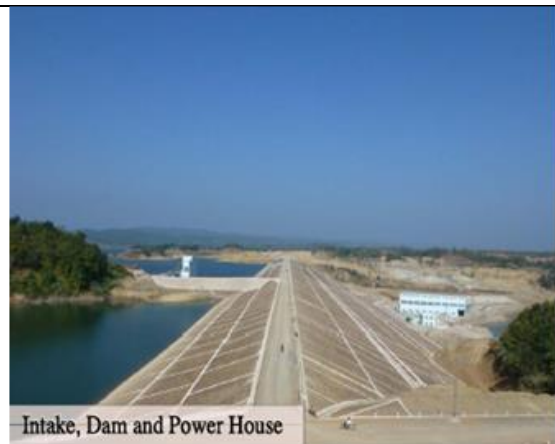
(C) Roller Compacted Concrete Dam (RCC) (Yeywa).
